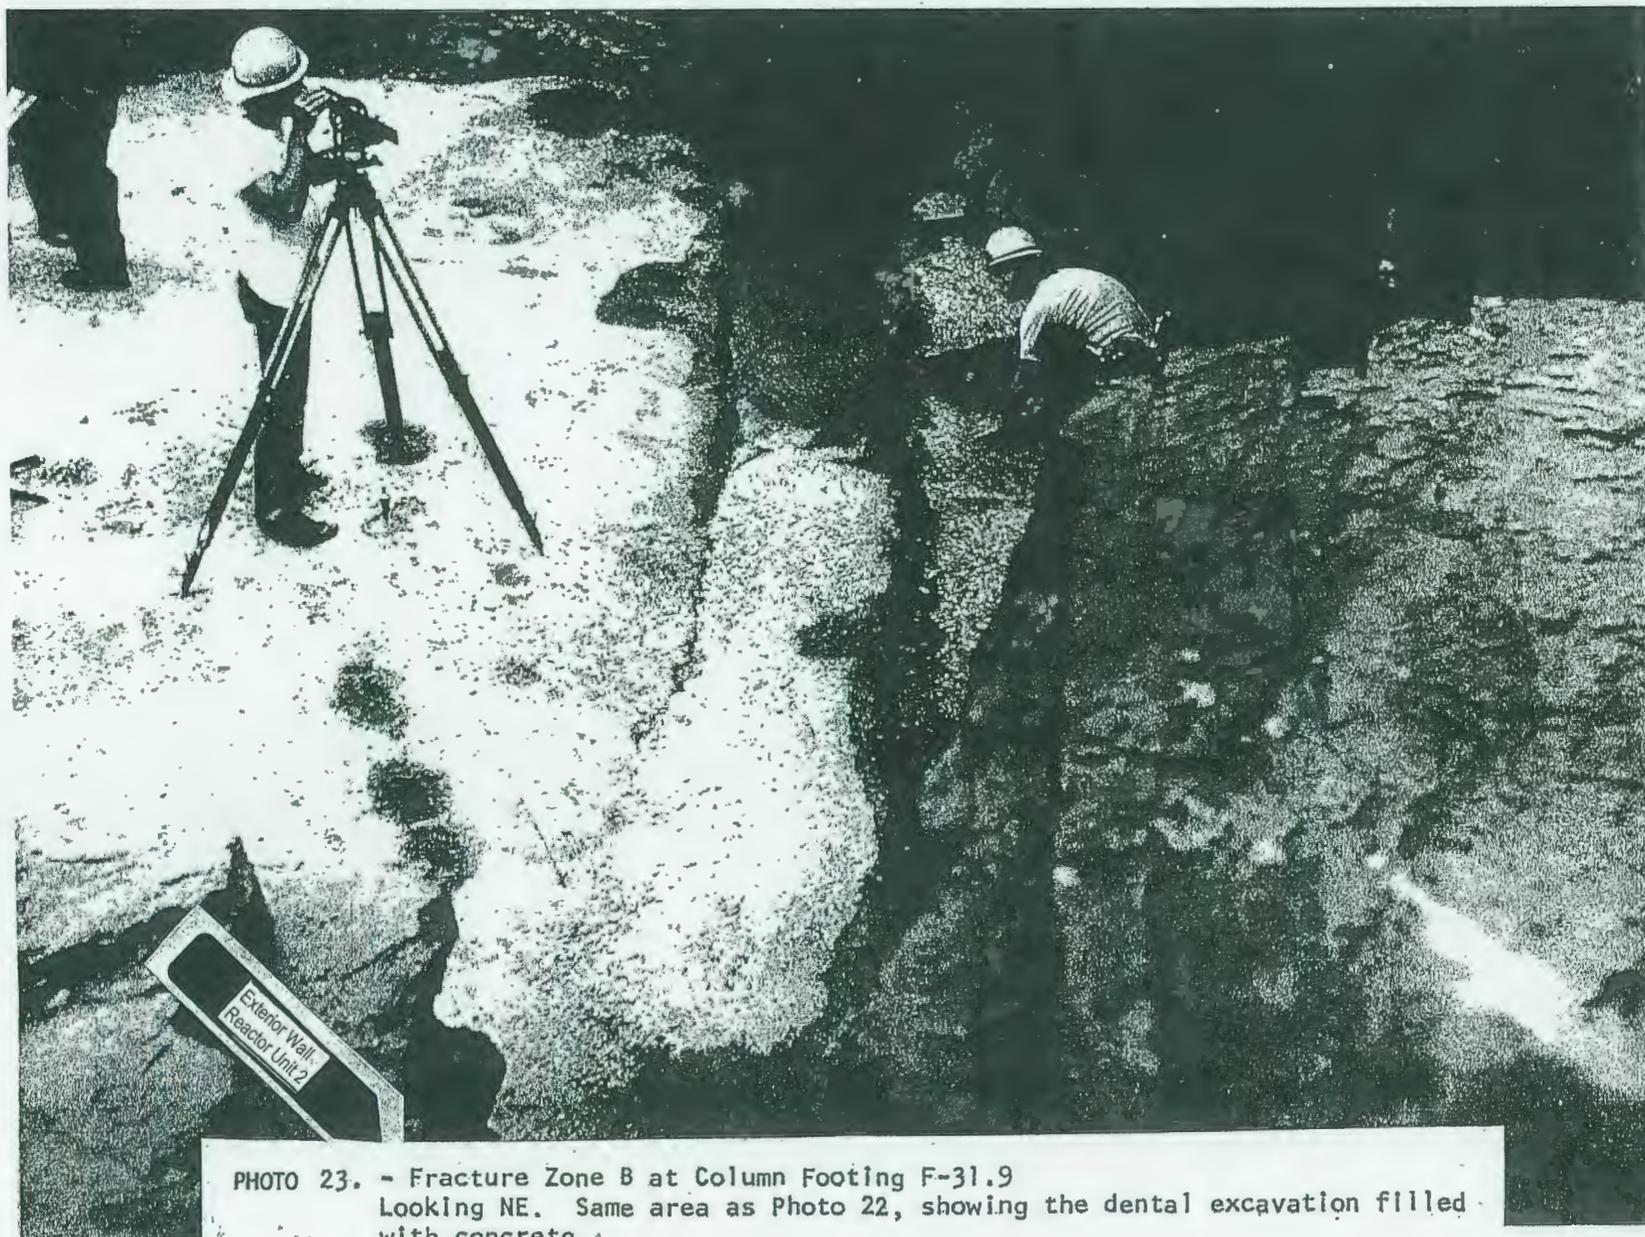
Fracture Zone B at Column Footing F-31.9
